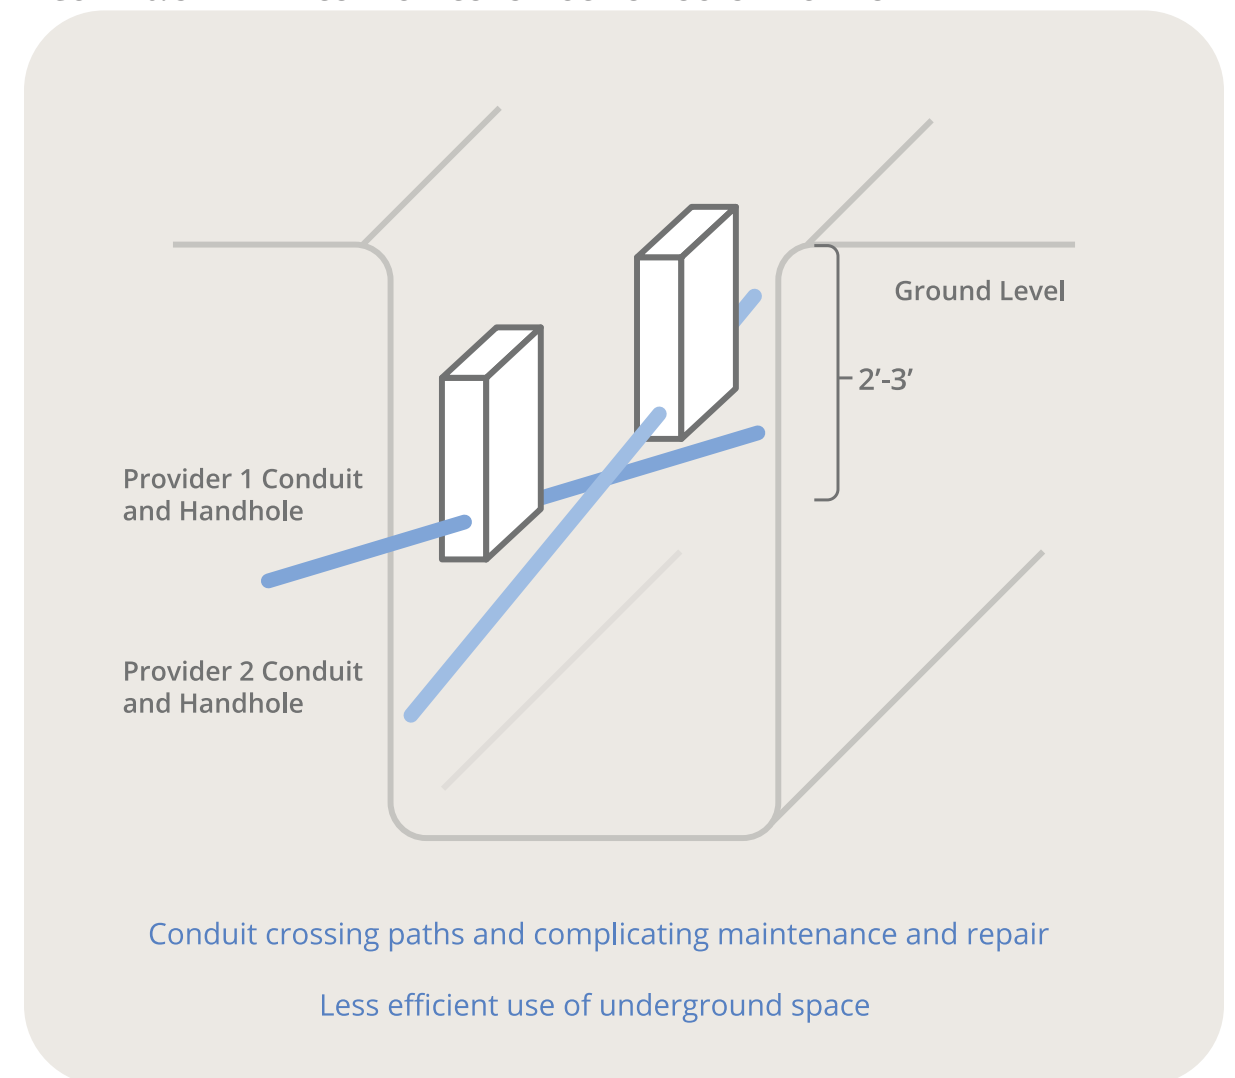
SEPARATE CONDUIT CONSTRUCTION OUTSIDE UNIFORM BANK
